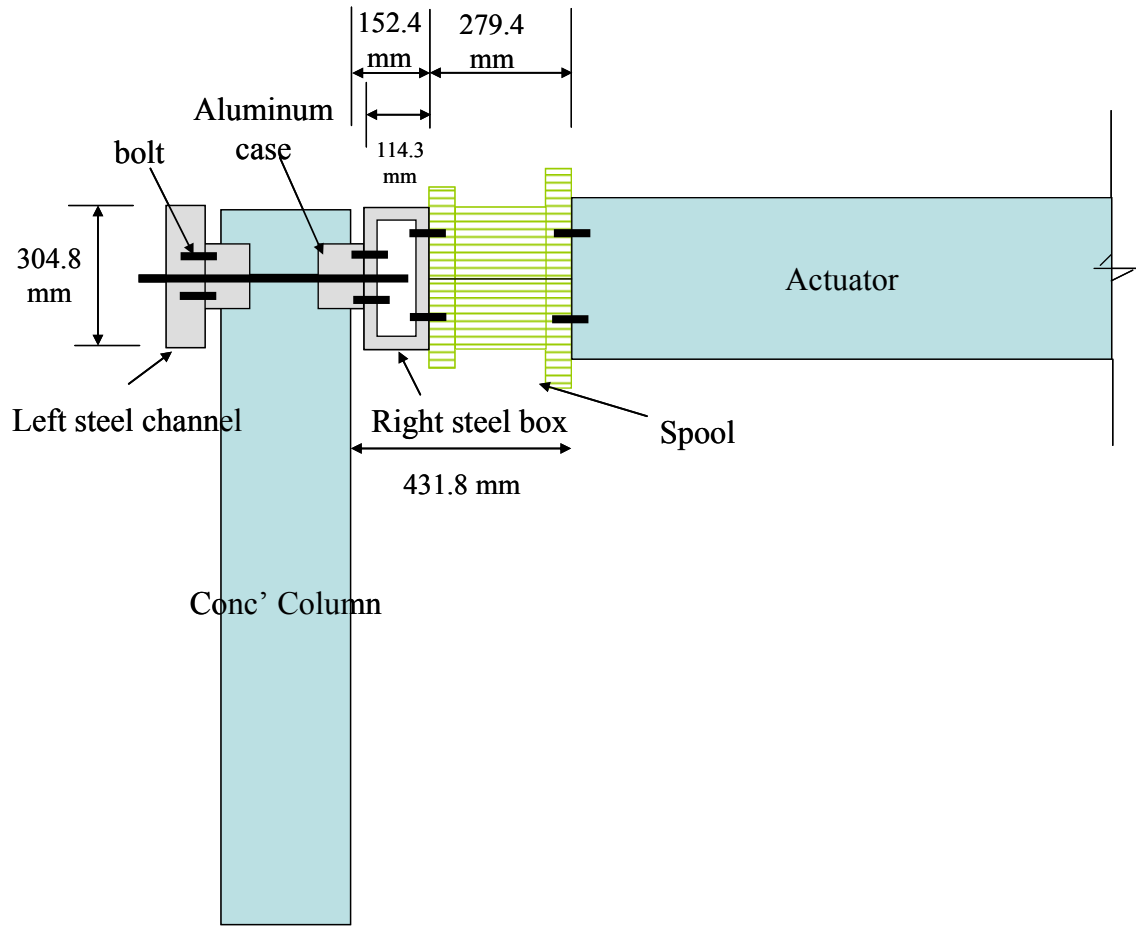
Front view of the column testing set-up with details of fixture plates.
